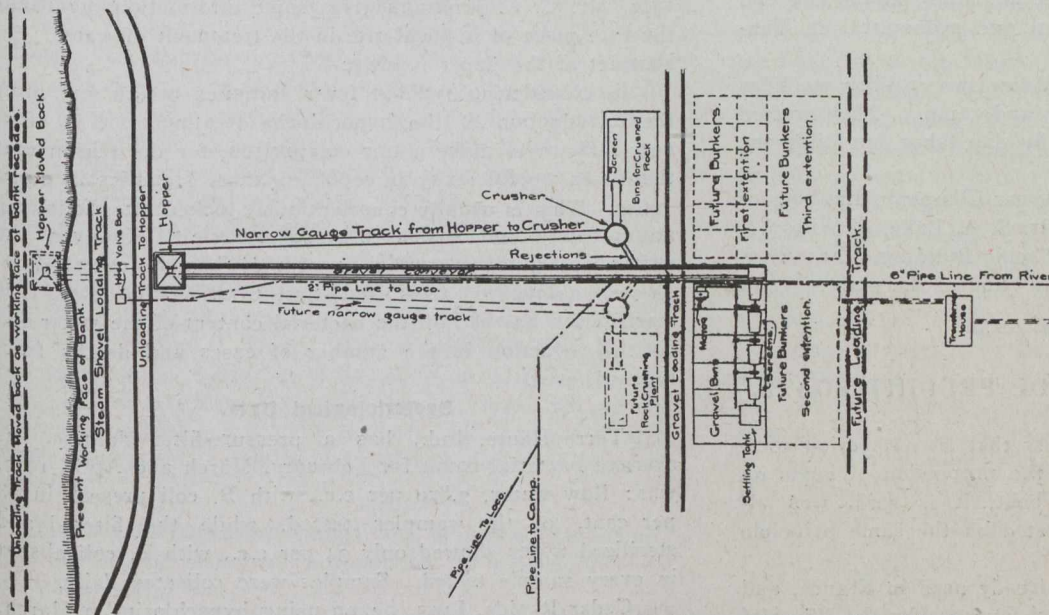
General Arrangement of the Gravel Washing and Screening Plant.
